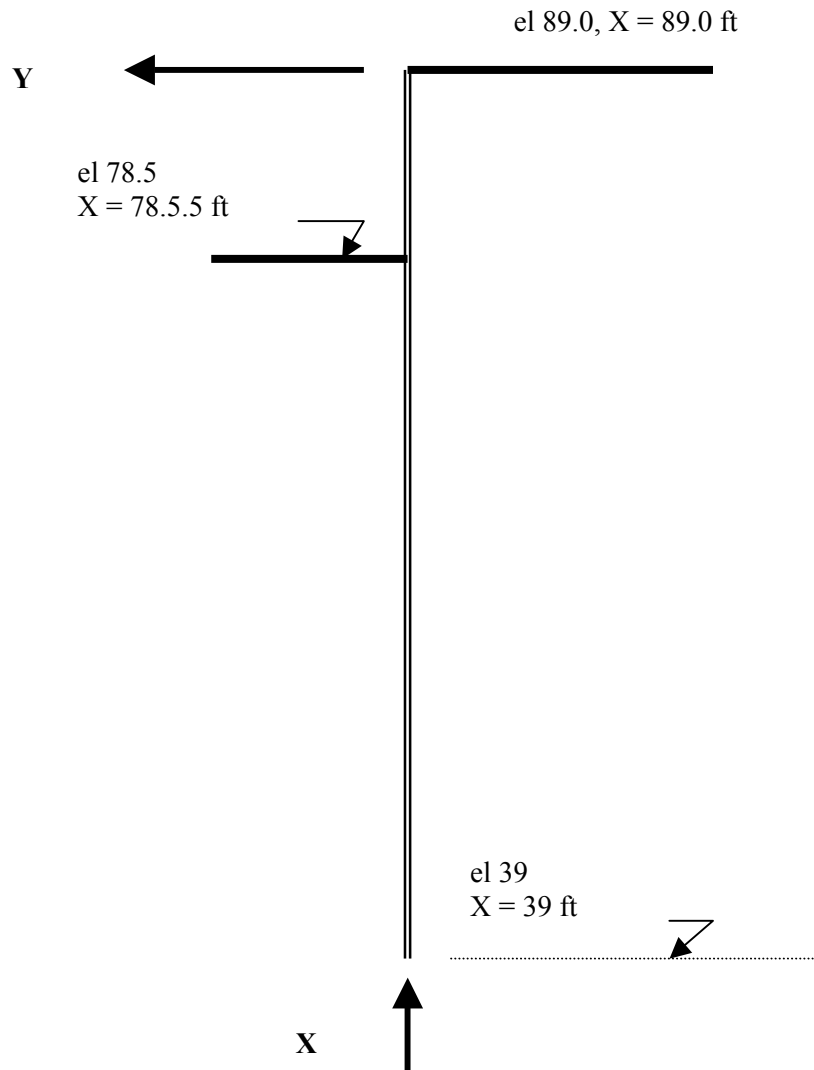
Step 4, excavate to el 78.5, first-stage excavation
